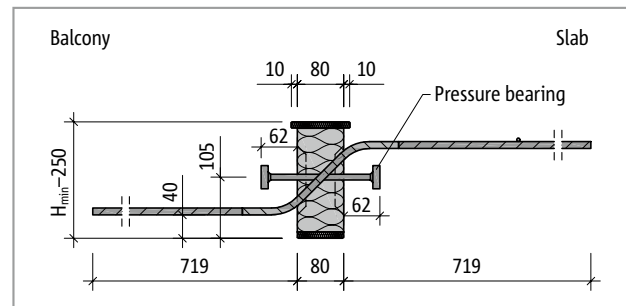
Schöck Isokorb® T type Q-P-V6: Product section
